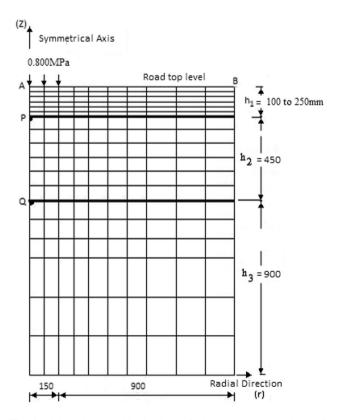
Finite element idealization of the pavement section (all dimensions are in mm)
